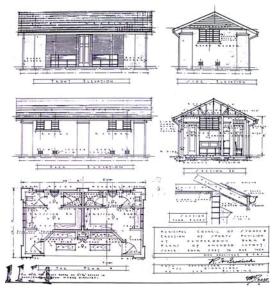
Plan from November 1925, showing the proposed pavilion and dressing sheds. Source: City of Sydney Archives.
